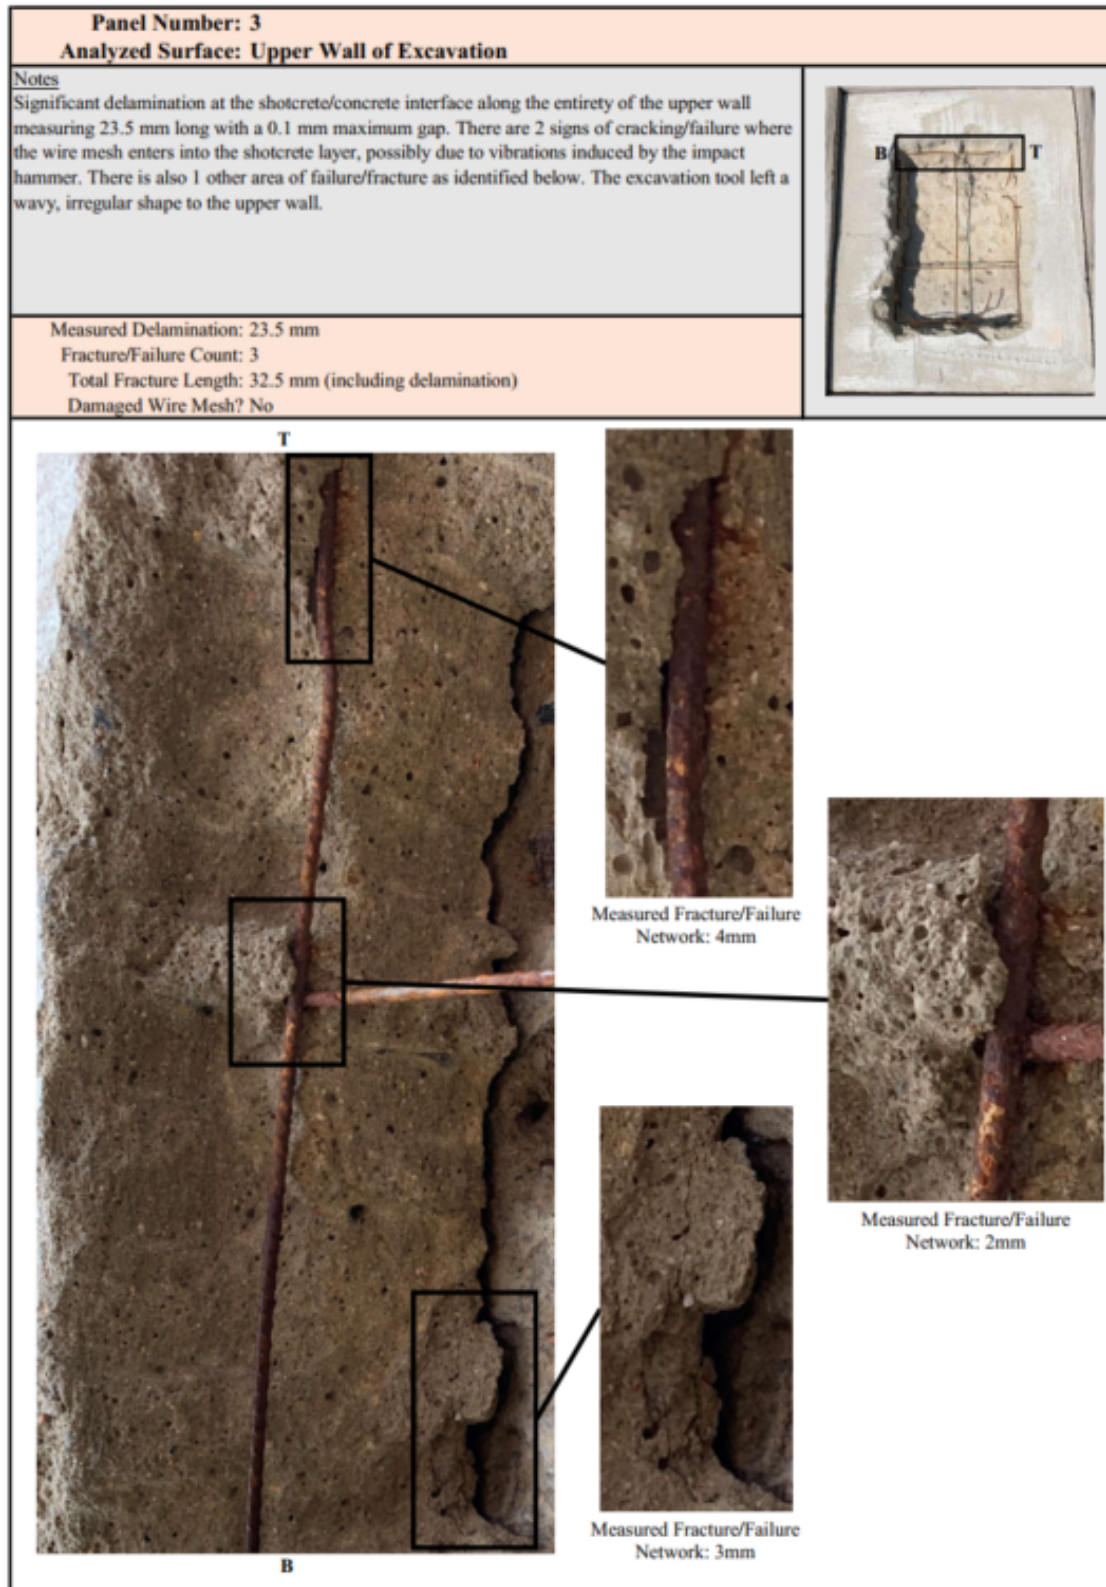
Impact hammer excavation upper wall profile visual inspection on panel 3.
